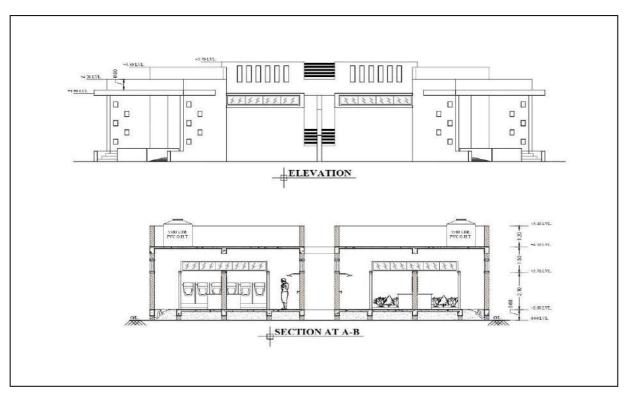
Elevation & Section of Public Toilets & Baths
